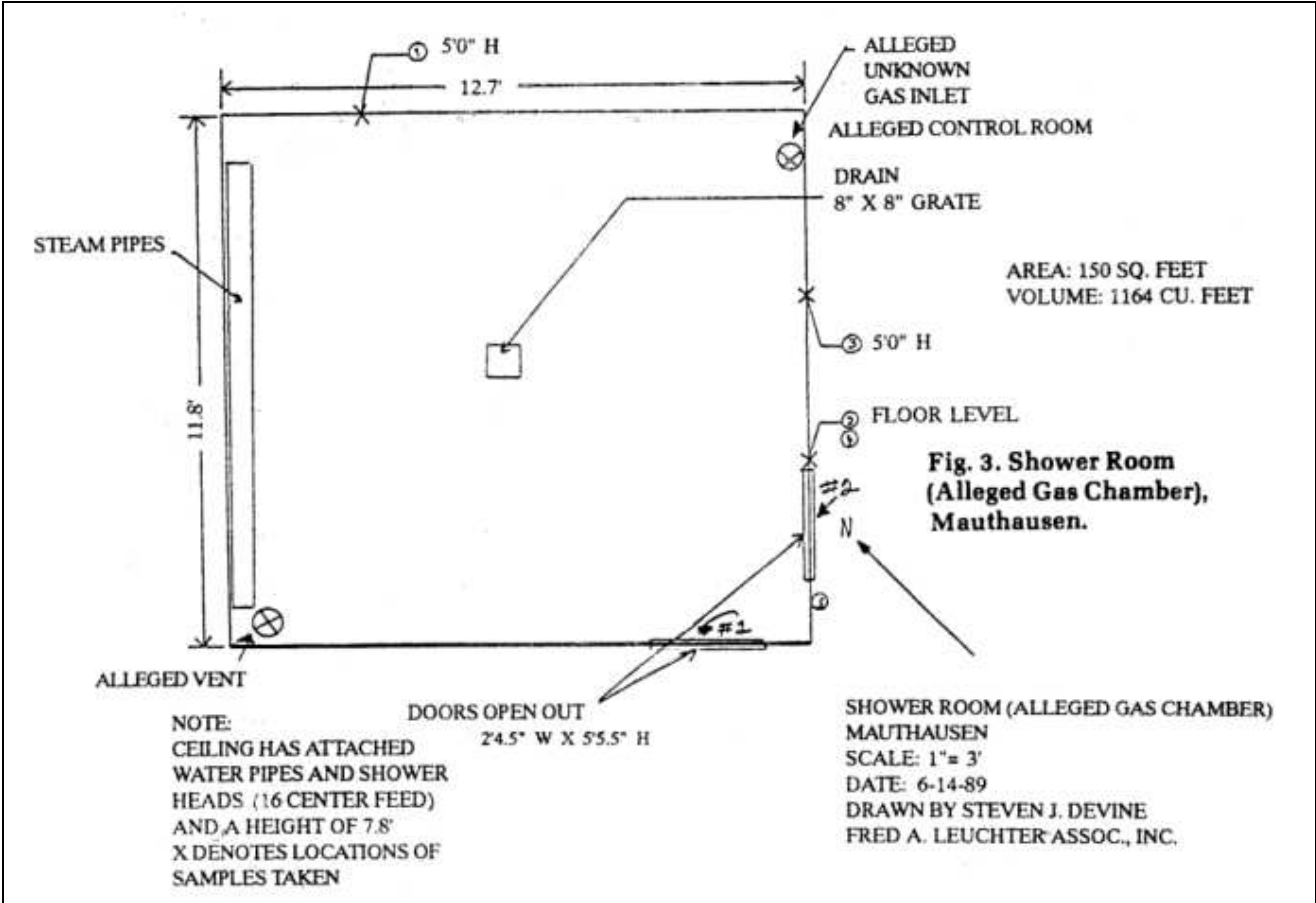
Floor Plan of the shower (alleged gas chamber) at Mauthausen camp, Austria.
